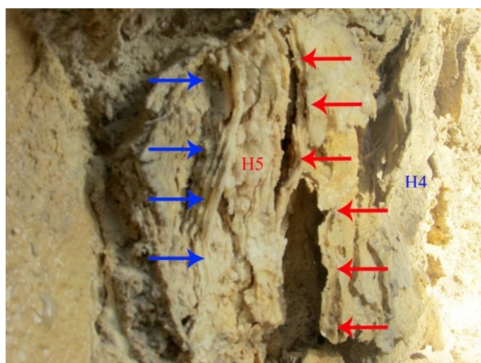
Blue and red arrows shows The longitudinally separation of sedimentation layers According to Bedding Plane As a result of the pressure force caused by salt crystallization longitudinally, H4: Place of fallen stone sample, H5: a sample from efflorescence of salts Longitudinally According to Bedding Plane.
